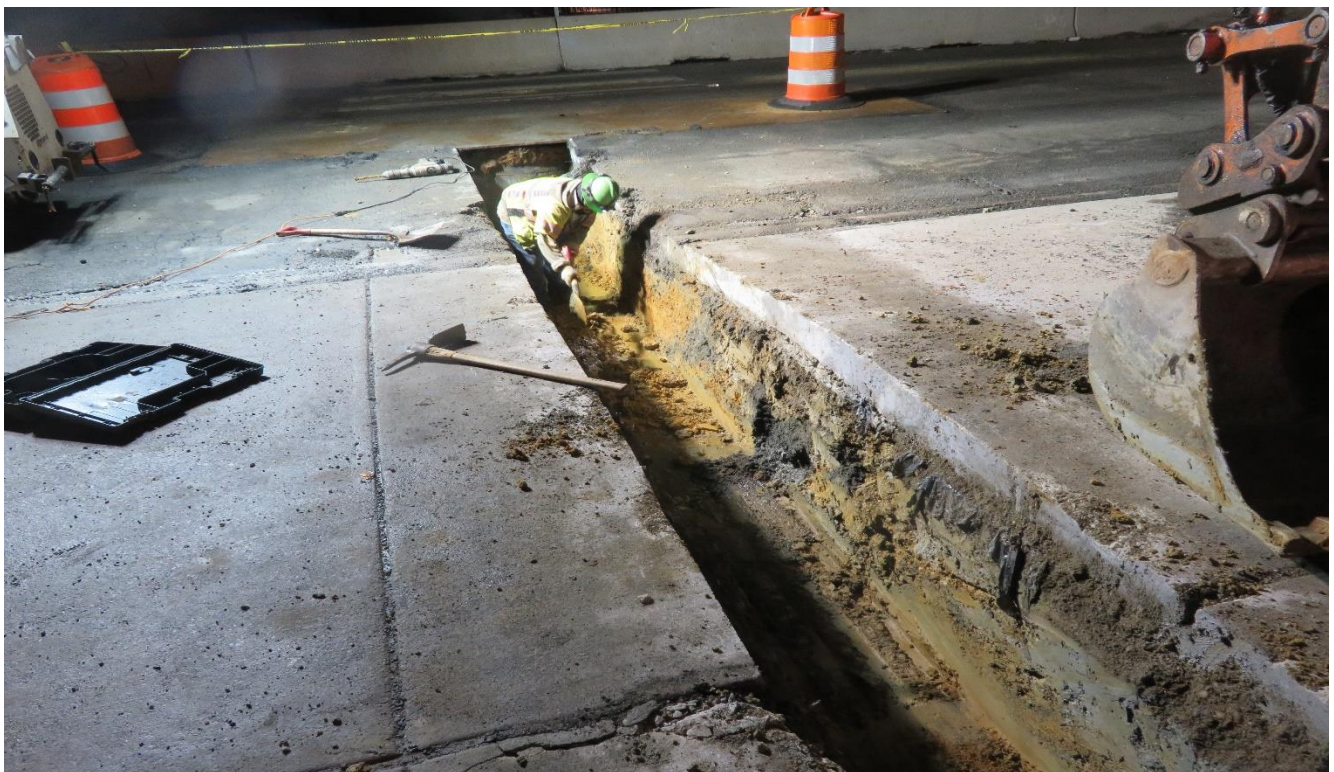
02/22/2018 – Excavating for connecting pipes.
